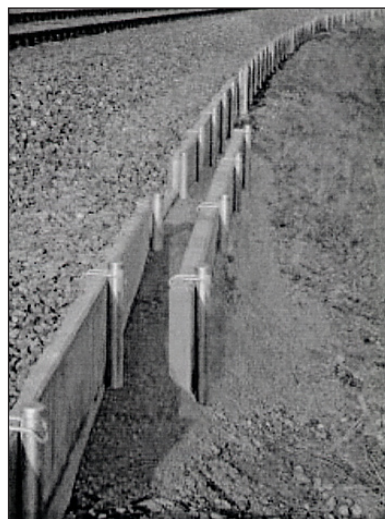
The barrier effect of the wall can be reduced by breaking up the linear structure. What's shown in this photo for a small structure along a railway line, can be achieved for walls with a height of several metres too. The example in the picture is currently being observed as it is not clear if it will successfully permit amphibian migration. (Photo courtesy of Esther Krummenacher, Hausen)
